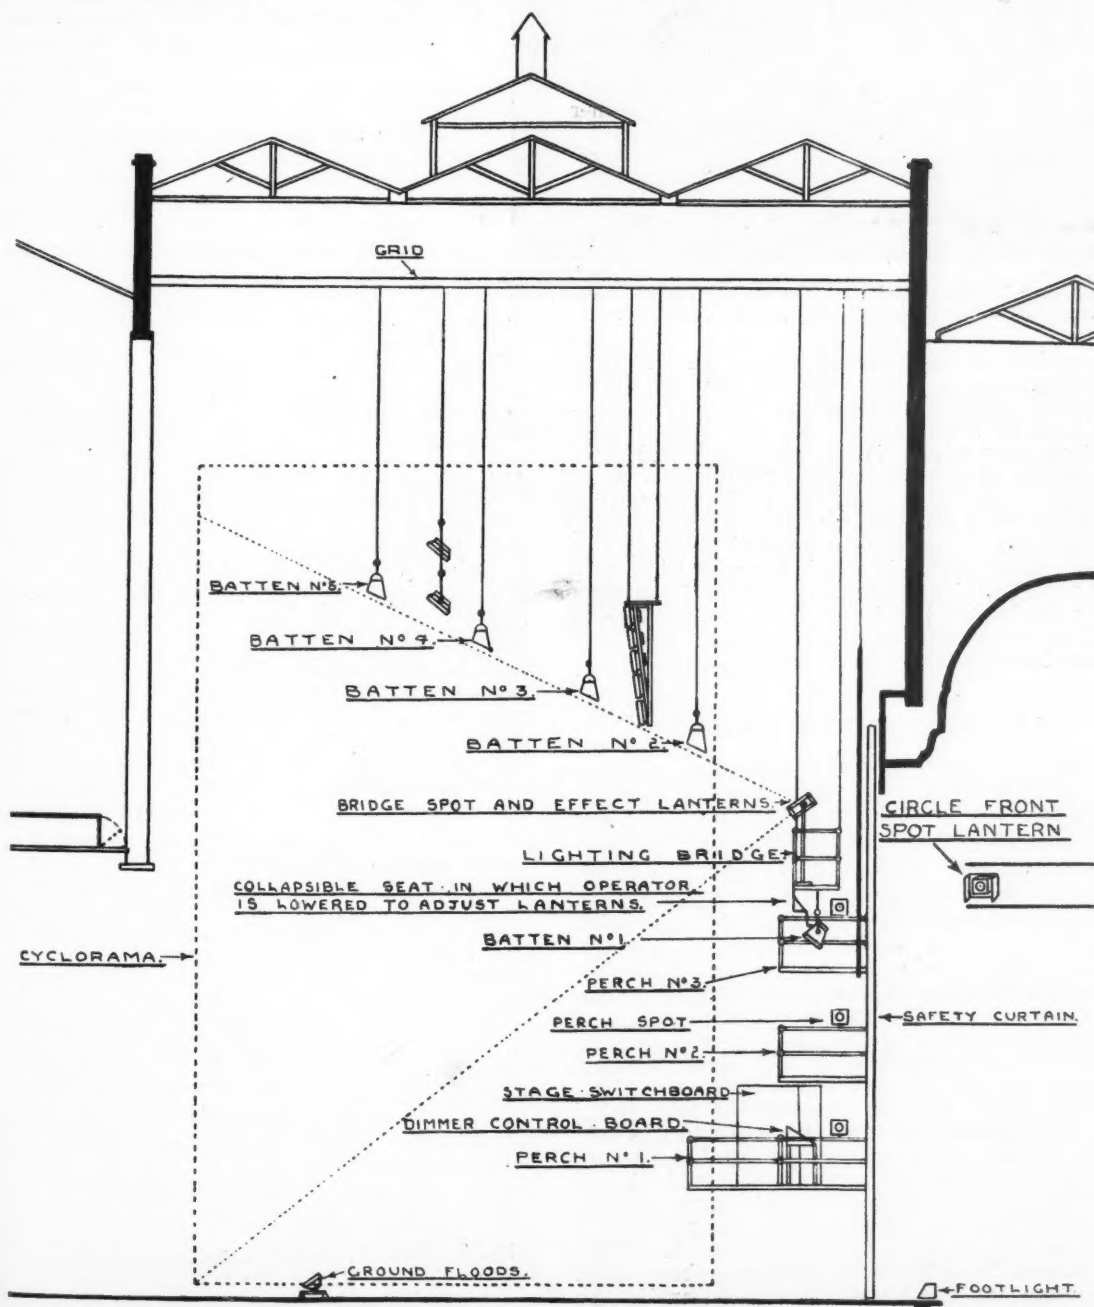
General View of the new Stage Lighting Installation at Royal Opera House, Covent Garden, showing Battens, Footlights and Bank of one hundred and fifty 1,000 watt Lanters used to illuminate the Cyclorama.
